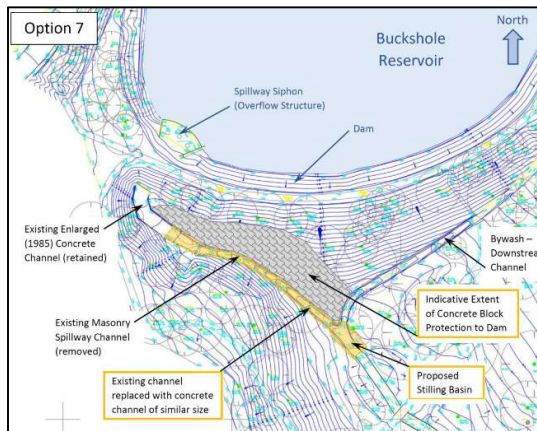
Short-listed option 7: proposed new spillway channel and downstream face reinforcement (concrete blocks)
